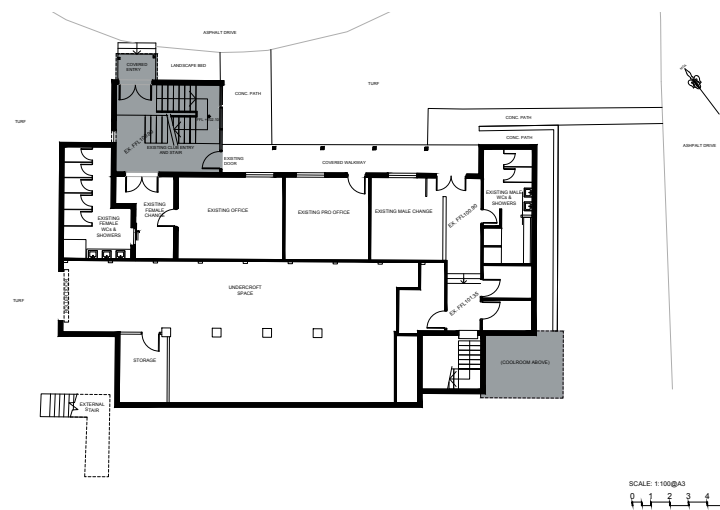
Existing Conditions : Cheltenham Recreation Club : Lower Level Floor Plan (2020)
